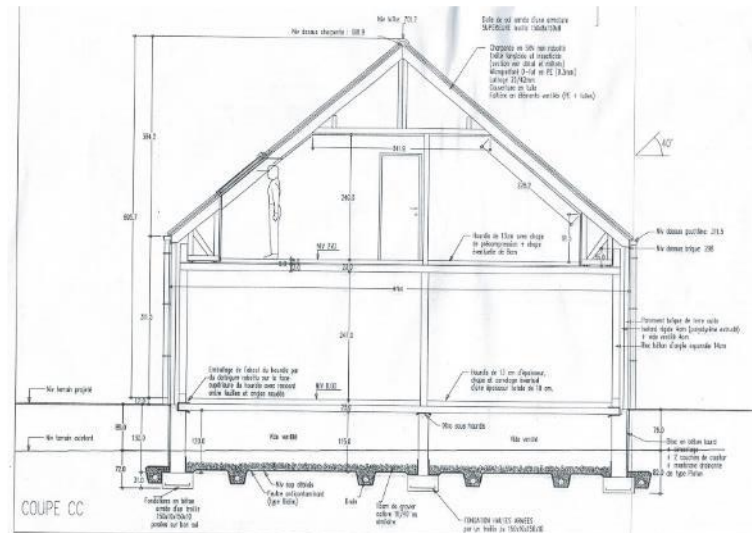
Cross section of the house showing the roof slope and dimensions
